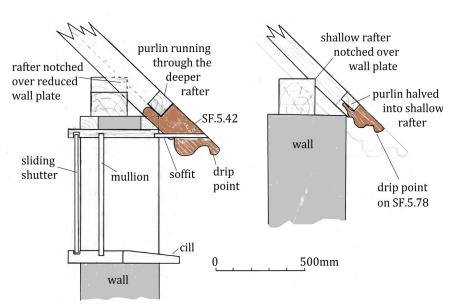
Conjectural sketch of the 2 ogee moulded timbers as rafter ends
